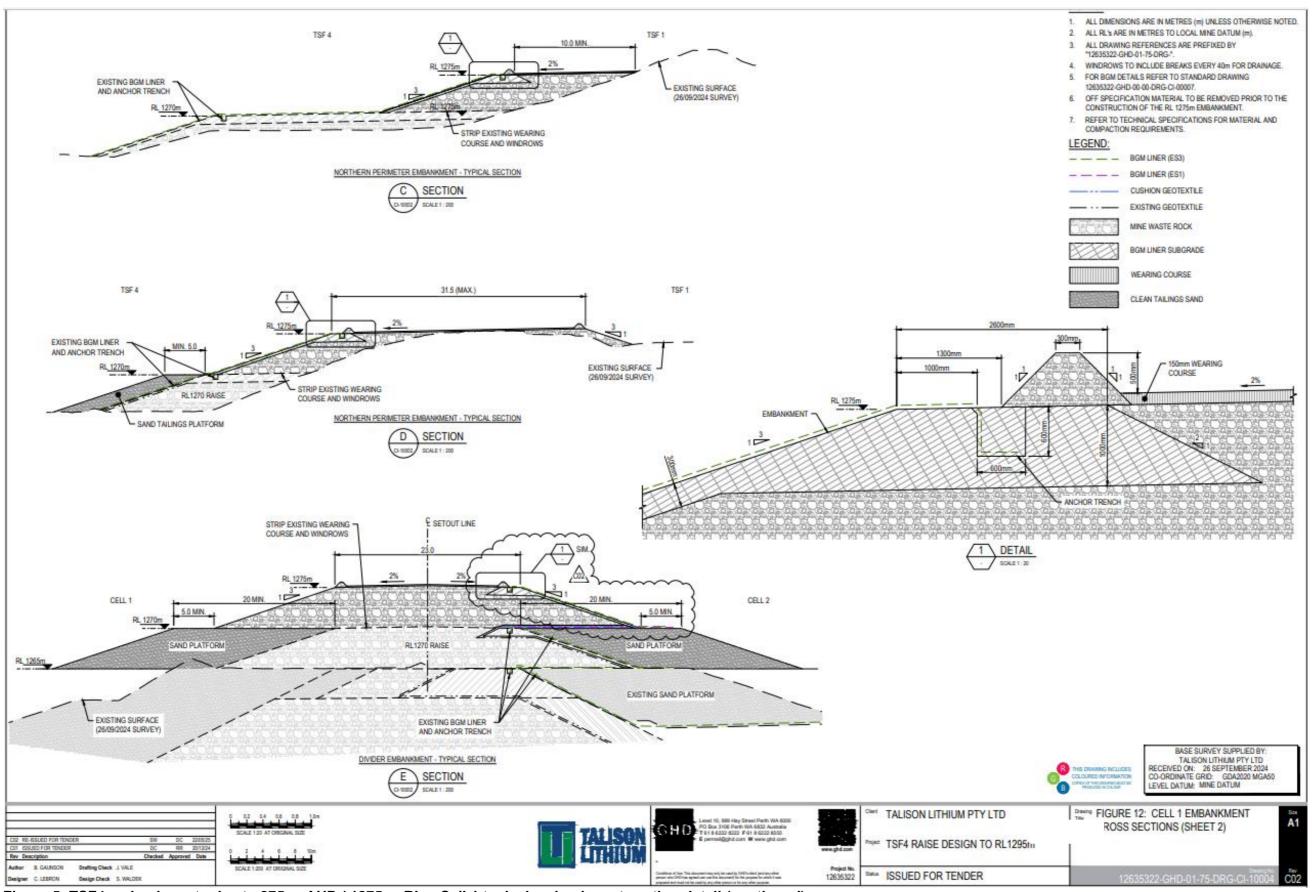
TSF4 embankment raise to 275 m AHD / 1275 m RL – Cell 1 typical embankment section detail (continued)
